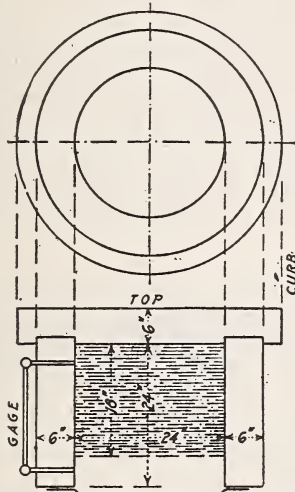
SKETCH SHOWING CONSTRUCTION OF THE TANKS
